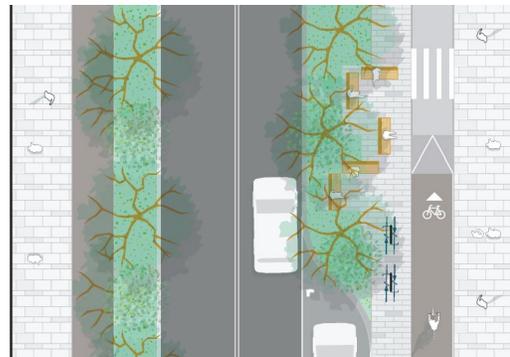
| Cross-section of the Urban Village street typology supported for a future 400 West from the SLC Street and Intersection Typology Design Guide
